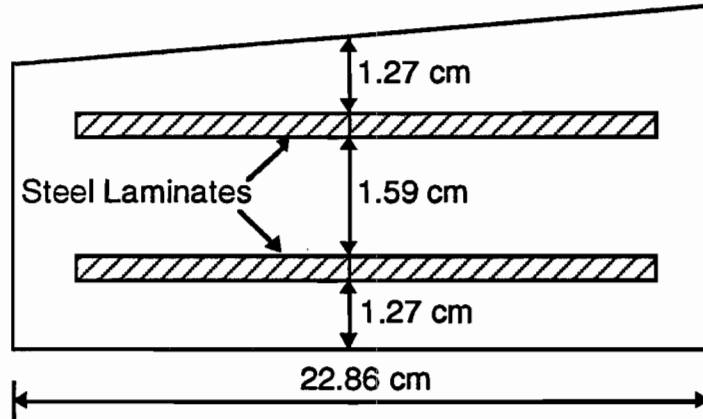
Cross-section of pad at Slaughter Creek bridge.
